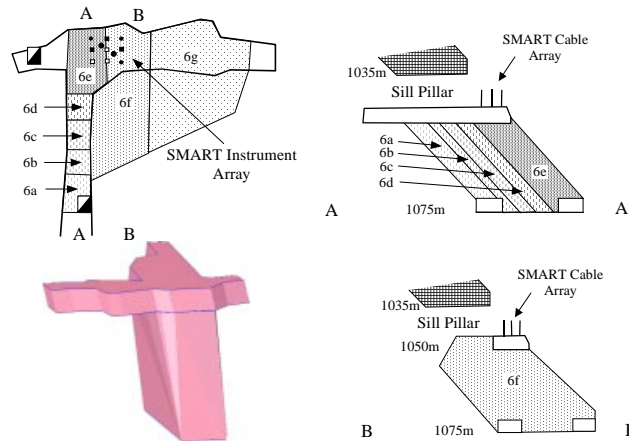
Views showing the sequence of mining (6a-g) within the test stope. Clockwise: Plan, cross-sections, and perspective view of the test stope at the completion of the 6f excavation zone (mining step 5).
